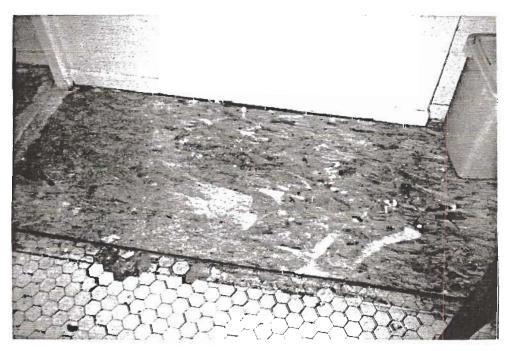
Second Floor: Missing and Damaged Tiles at Women's Bathroom.
